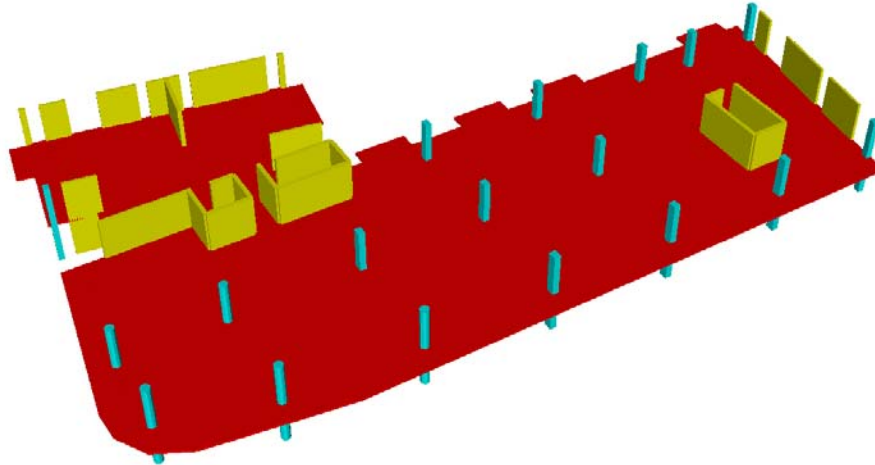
3D VIEW OF THE FLOOR SYSTEM
